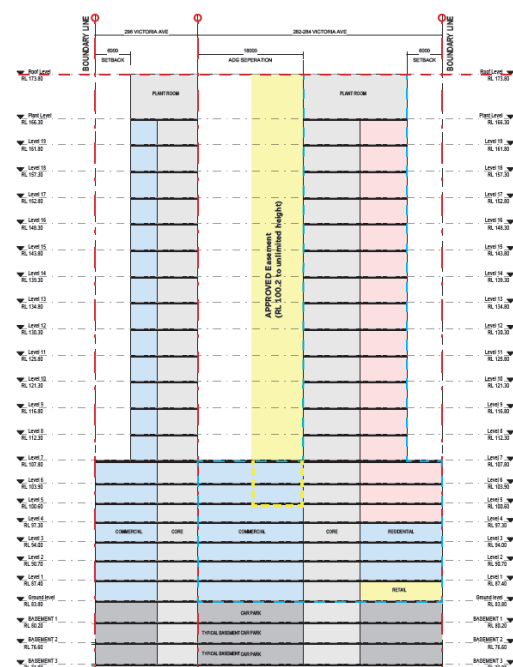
Proposed concept east-west section from Neridah Street to Bertram Street (source: APlus Design Group)
